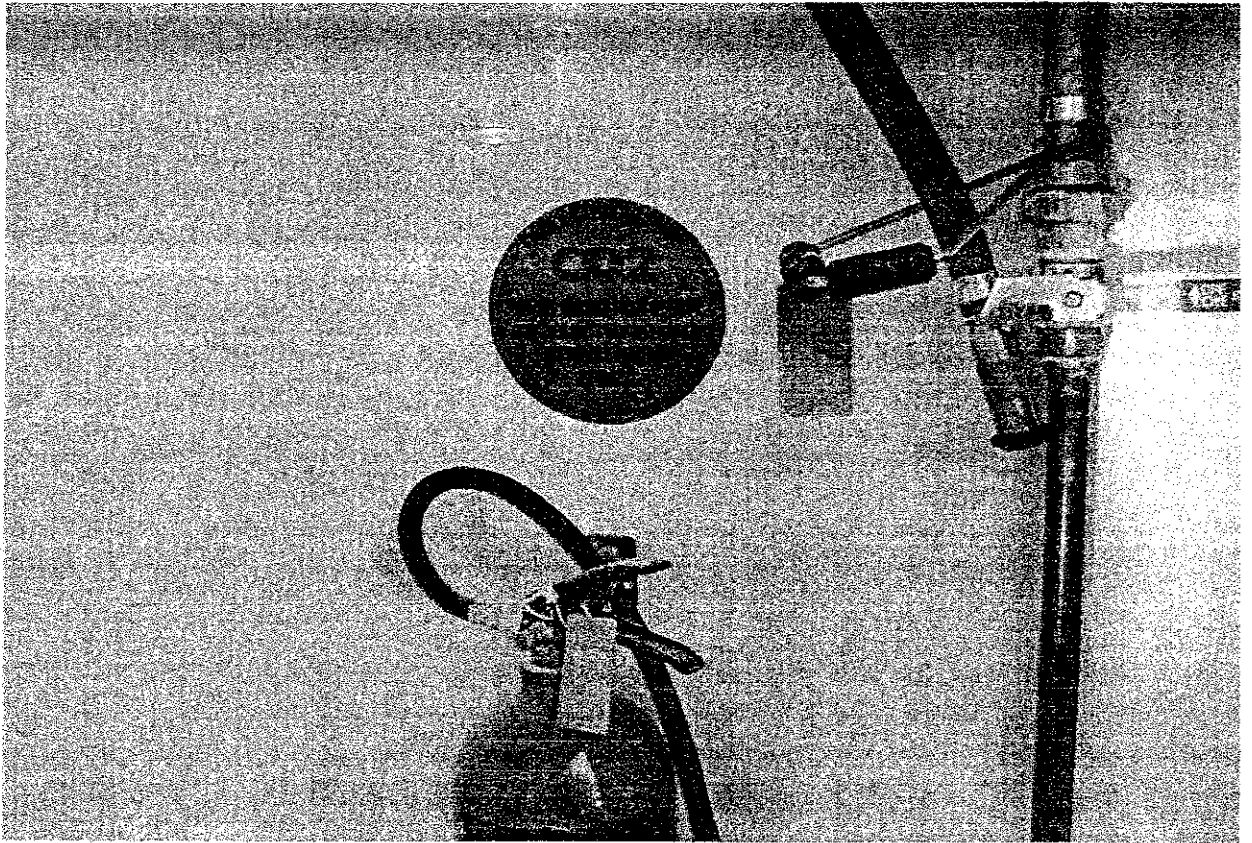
Hose Reel & Fire Extinguisher tagged & signage installed
